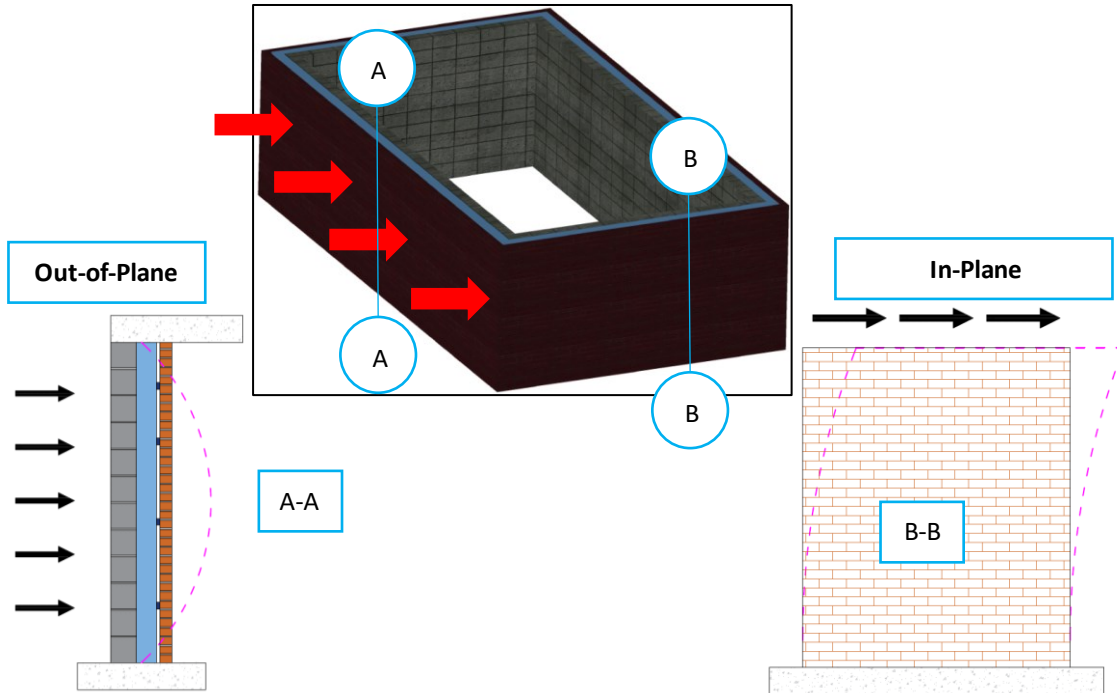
External loads on a cavity wall: (a) out-of-plane load and deflected shape, and (b) in-plane load and deflected shape.
